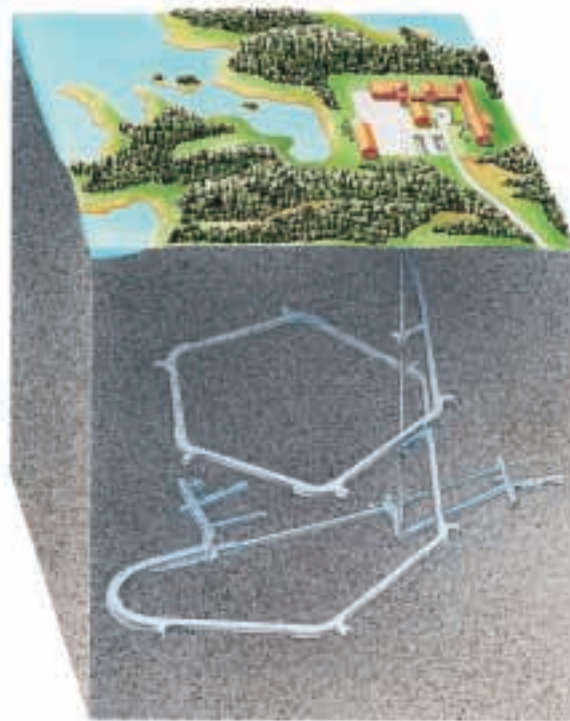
The underground portion of the Äspö HRL reaches a depth of 460 metres. The total length of the tunnel is 3,600 metres. The underground portion is connected to the surface facilities by hoist and ventilation shafts.
